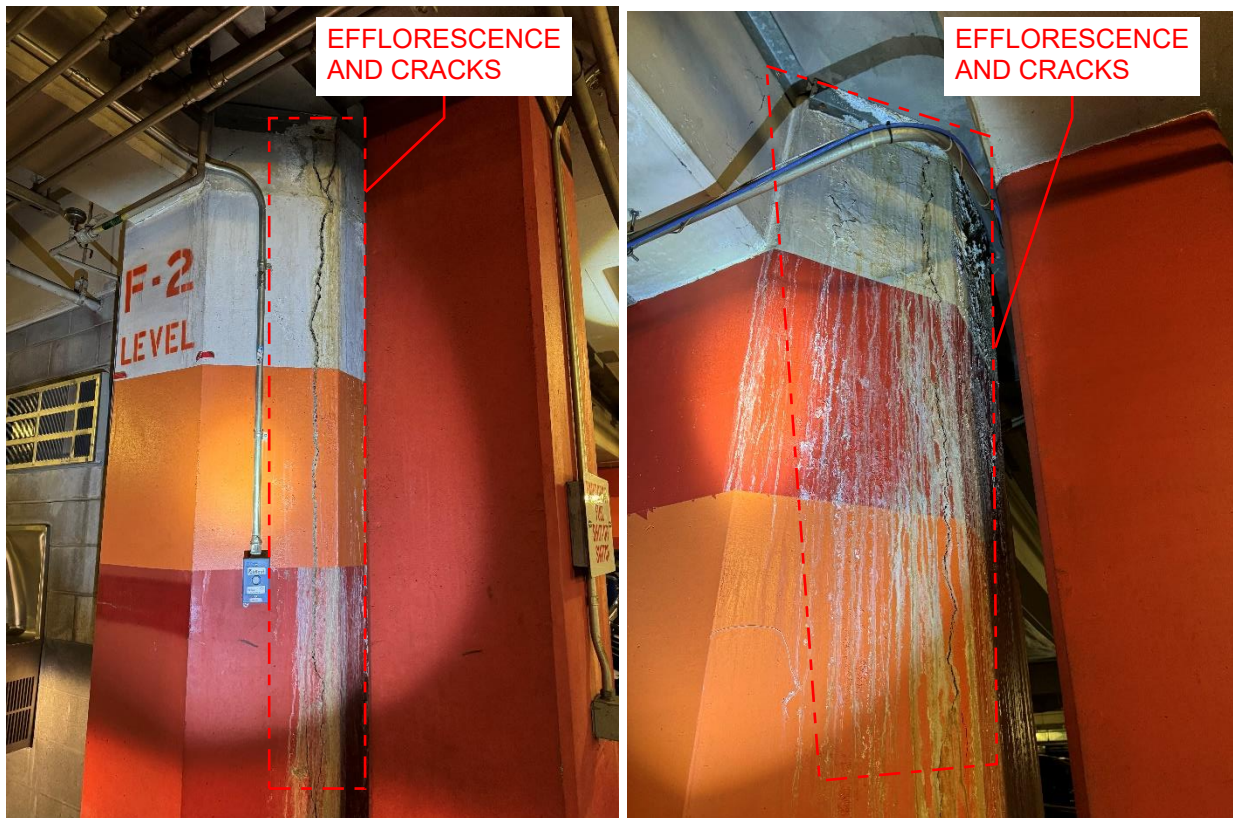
Column Corrosion Cracks and Efflorescence
